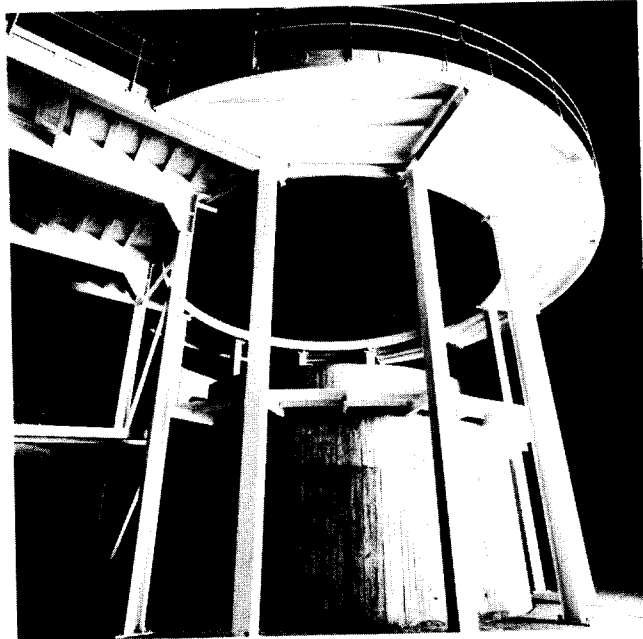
A perspective view of the cylindrical pier which will support the William Herschel Telescope within its building, showing the steel Cassegrain platform and its vertical supporting girders.
